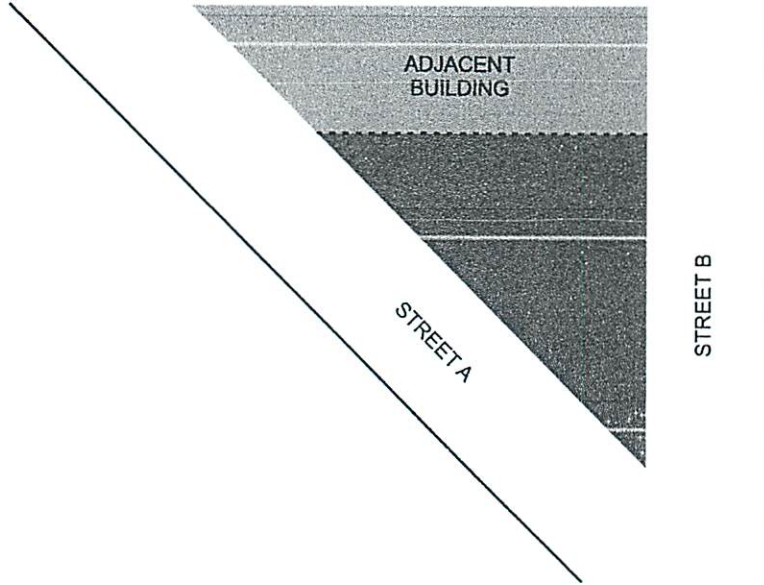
Flatiron building bounded by two streets and an adjacent building/lot.
